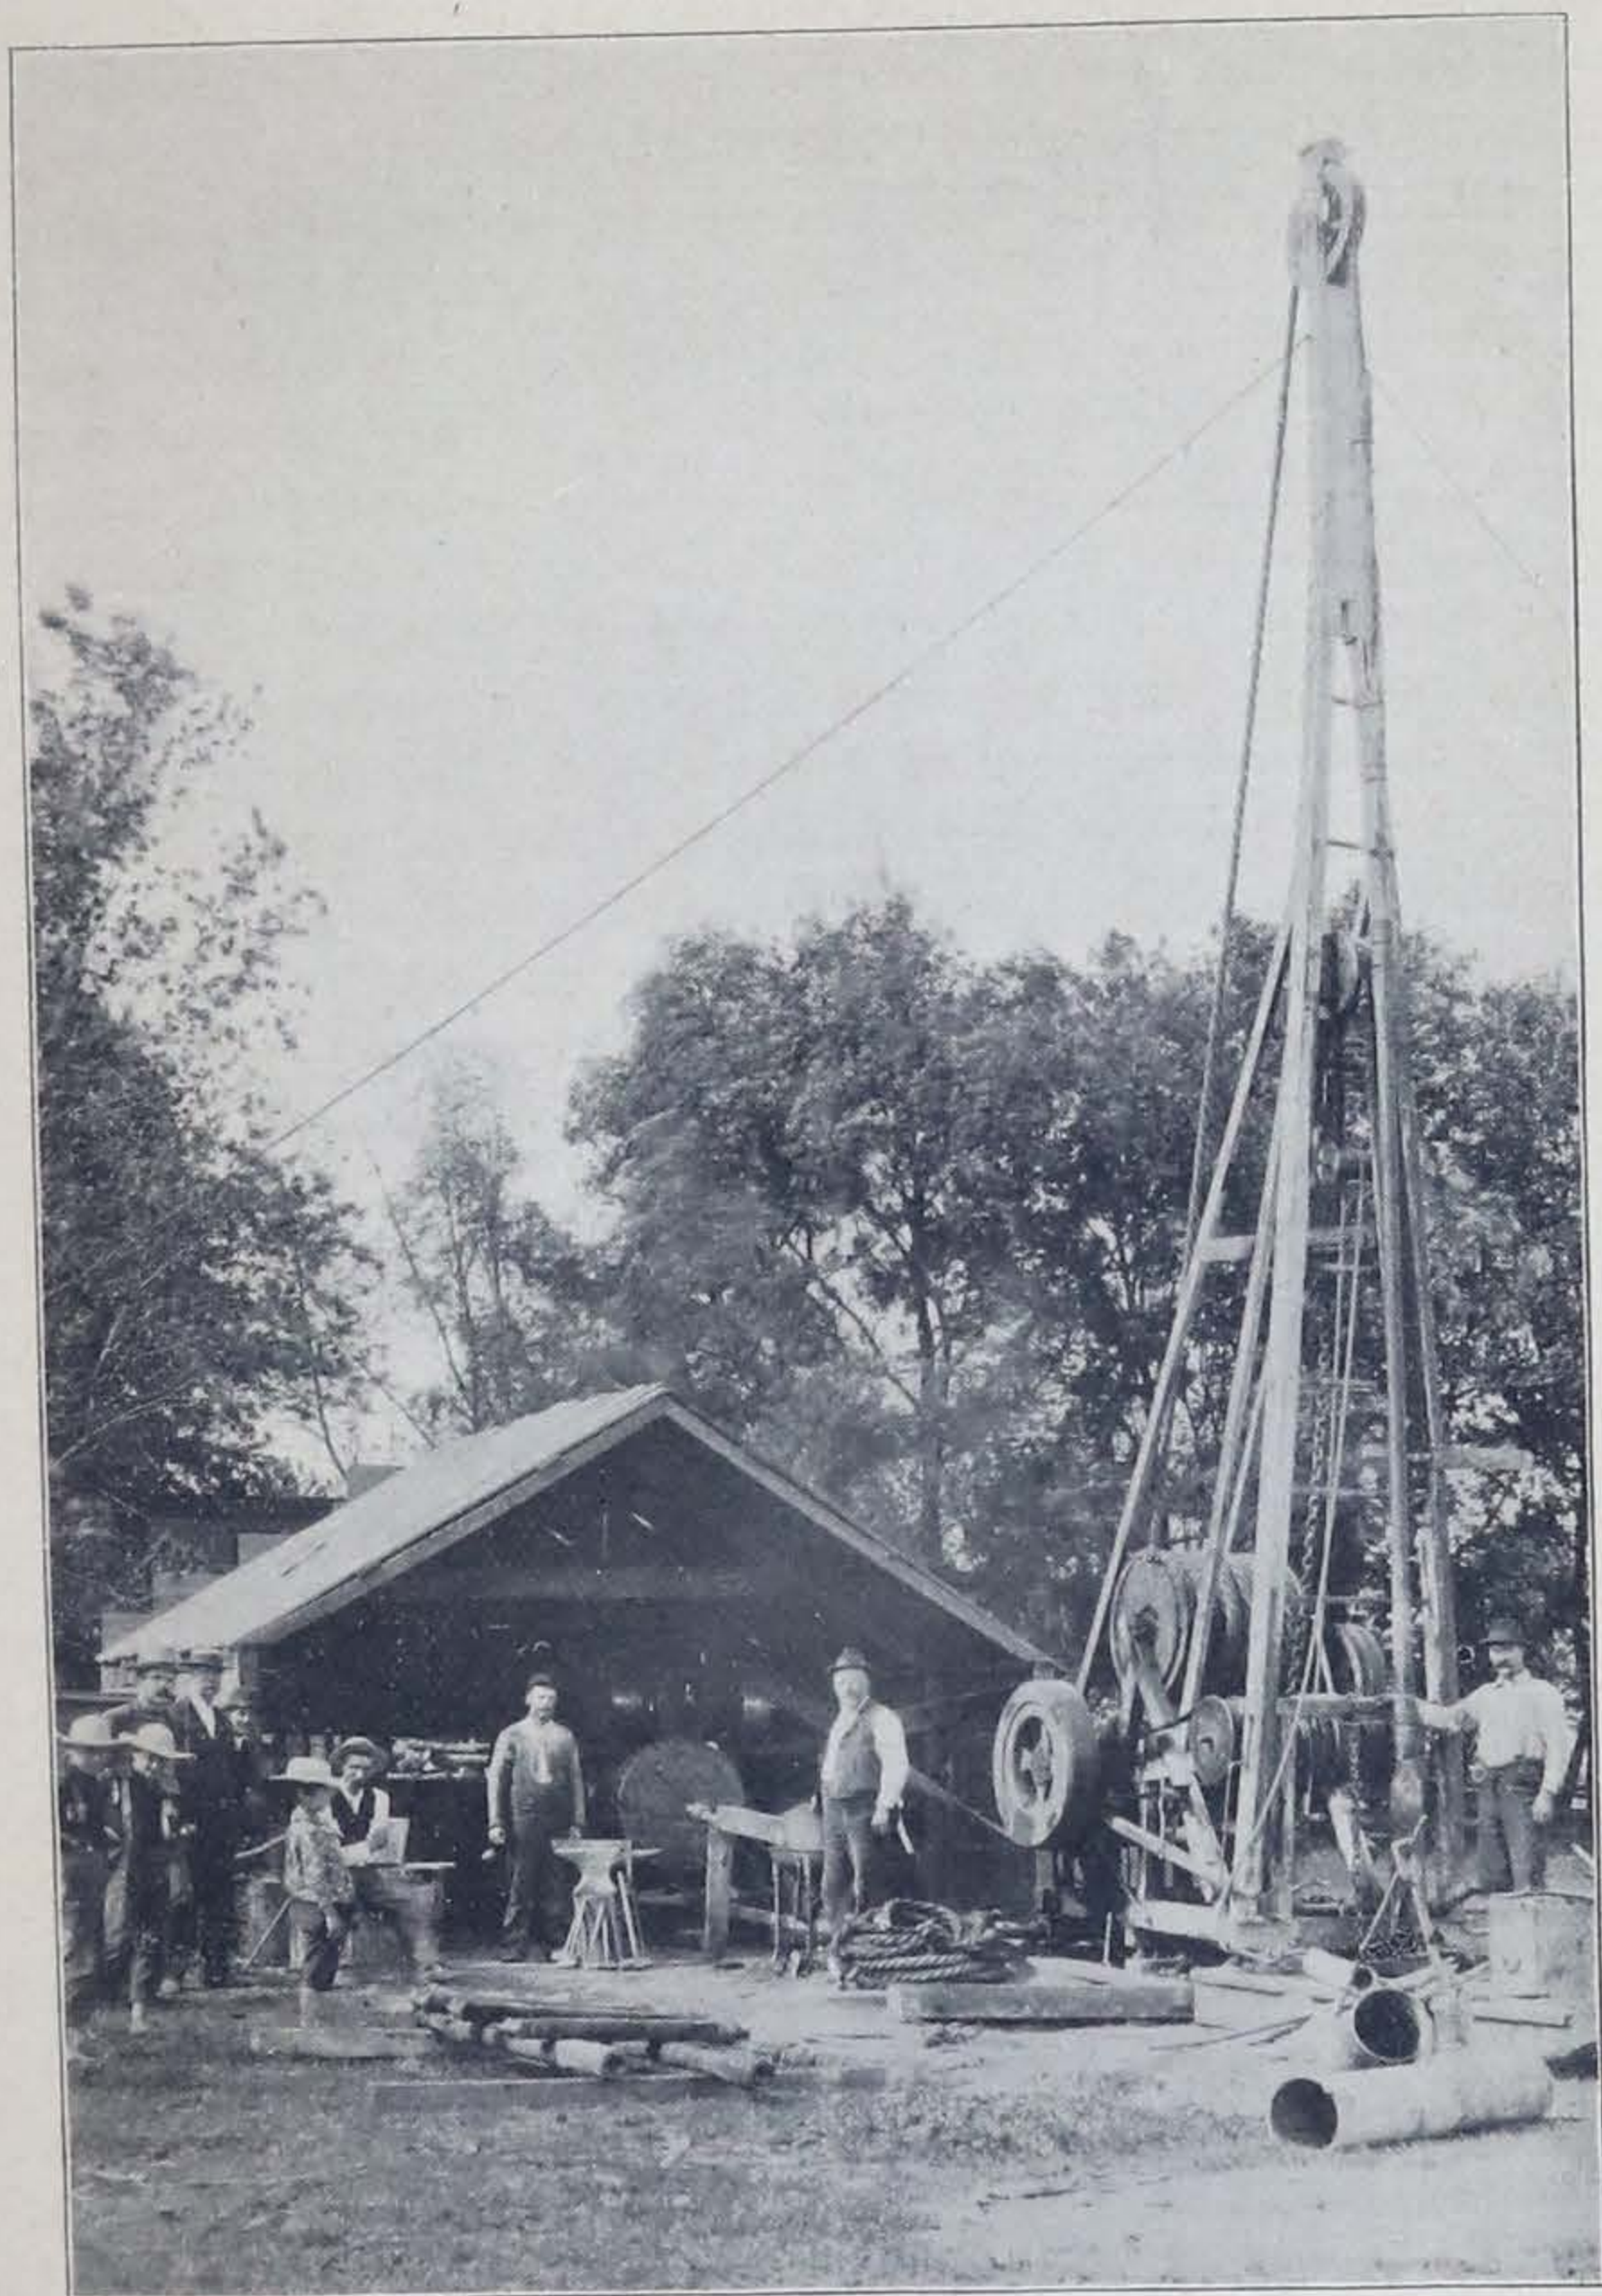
Derrick Tower of J. P. Miller & Co., at Holstein, Iowa.
